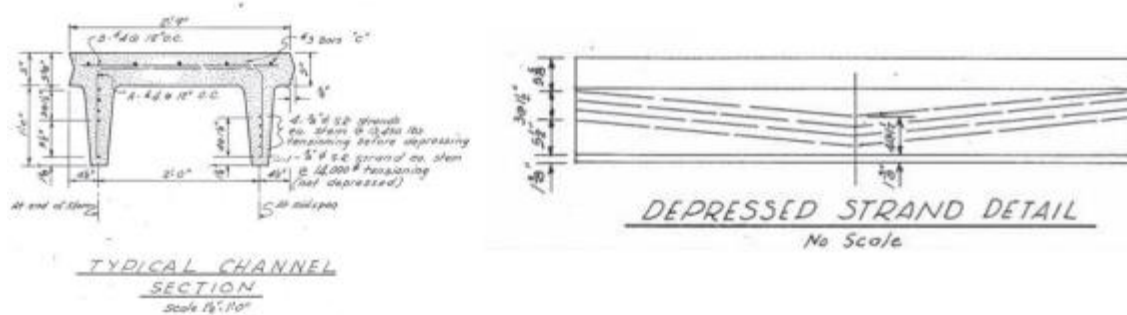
Typical cross-section of skinny-leg channel girder (SCDOT drawing)
